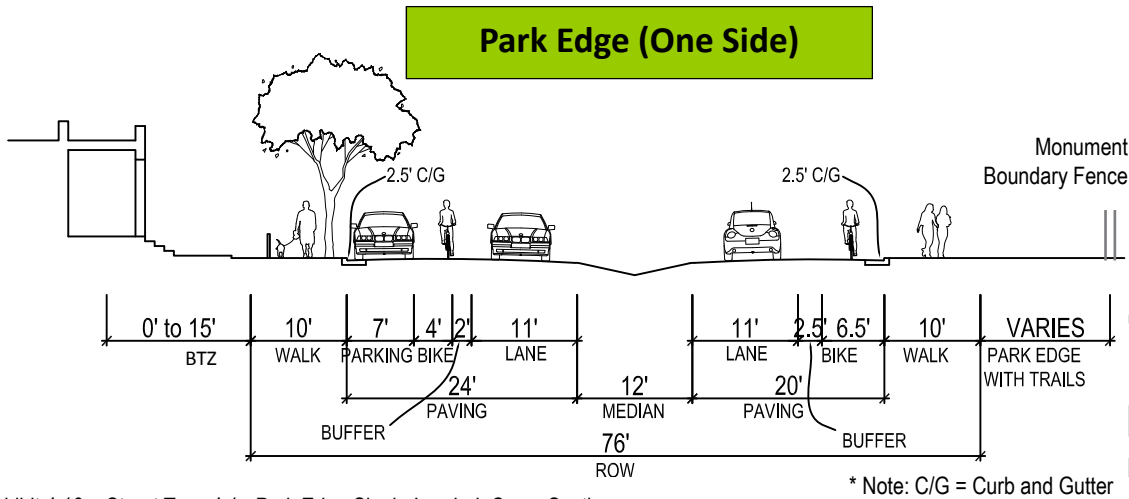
Street Type 4.1: Park Edge Single-Loaded Cross Section
